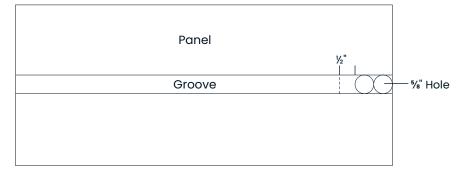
Drill two holes to create a rectangular slot in the subfloor.
